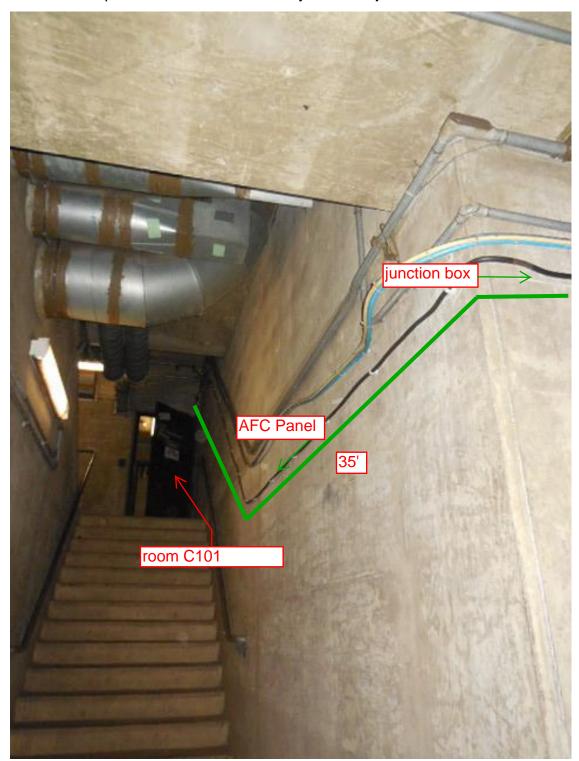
Proposed conduit run in hallway between junction box and Room C101
